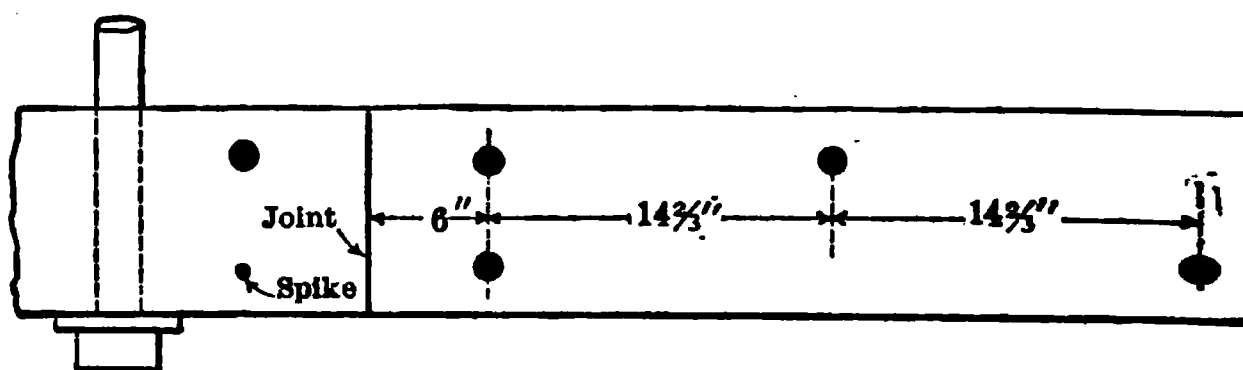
Elevation of Beam Opposite  $X$  of Fig. 25
